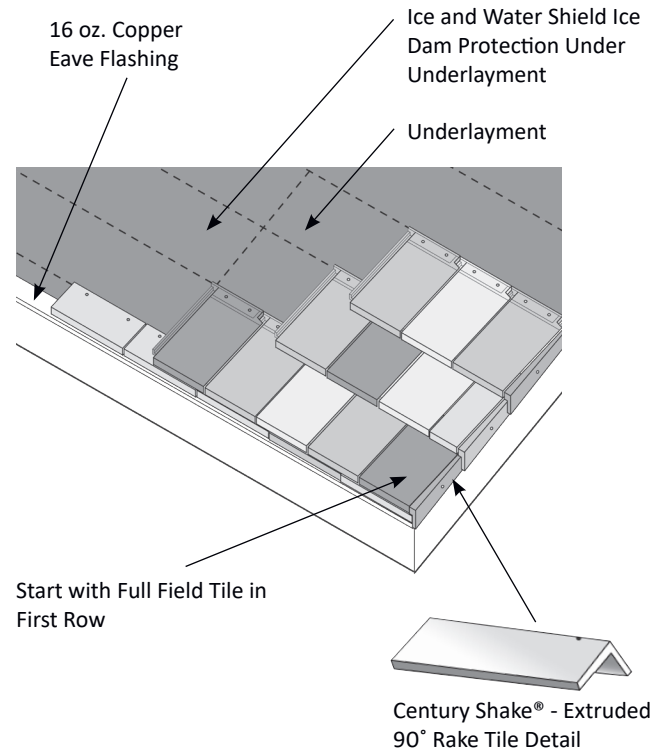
Lexington Slate® and Century Shake® Eave Detail with Cant Strip
